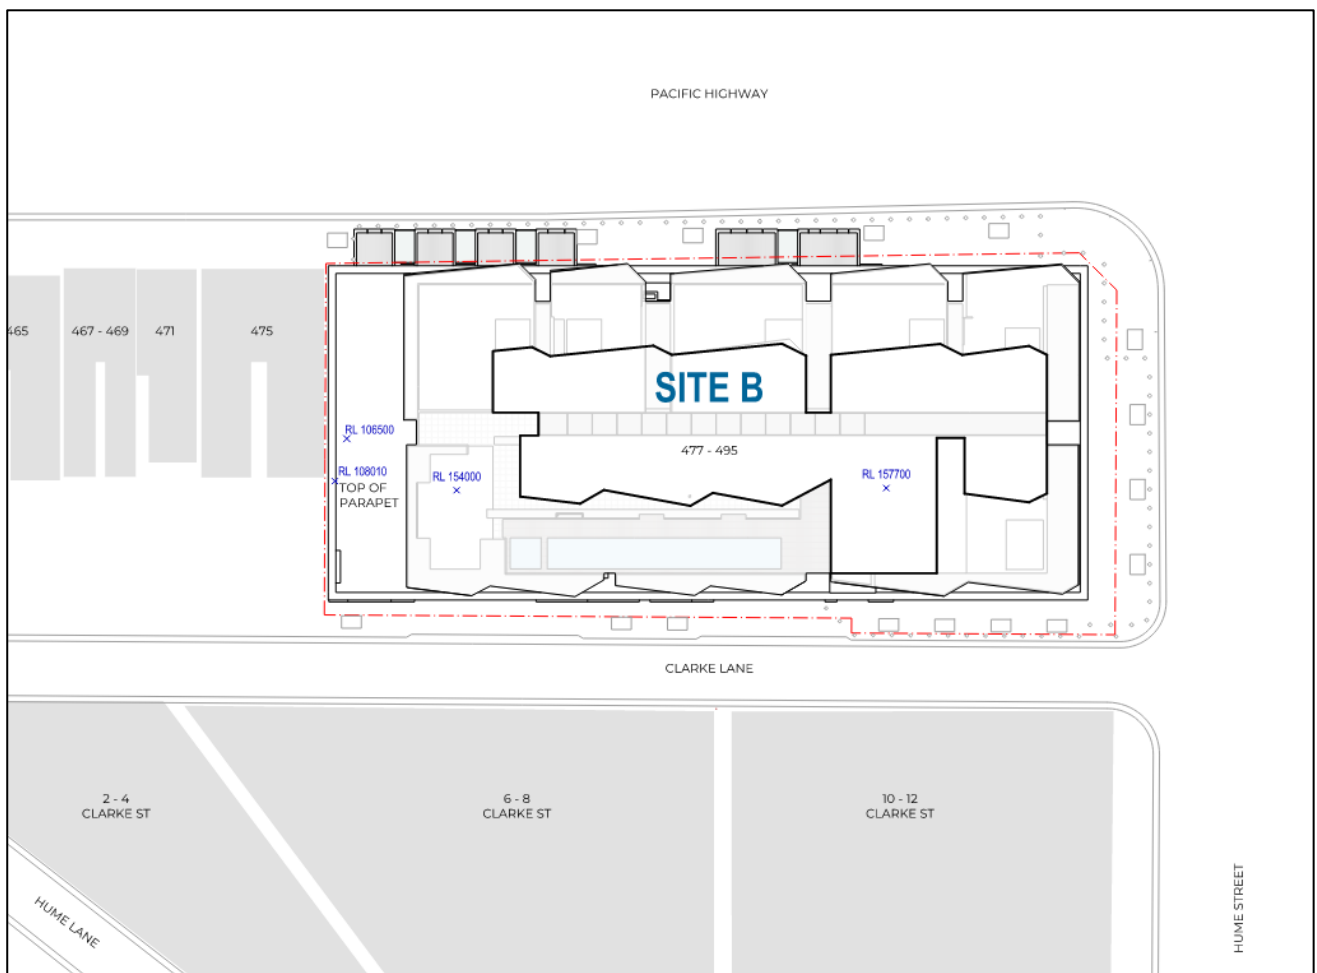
Proposed Site Plan (Source: Proposed Site Plan DA-1104 by Woods Bagot, dated 14 August 2024)
